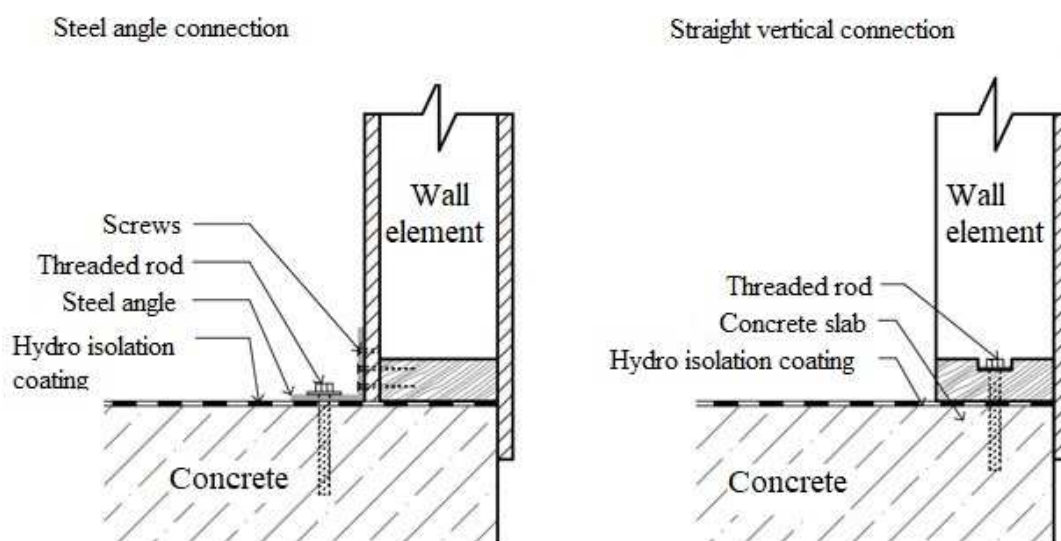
Basic connection of the foundation beam joist [2], translated.
